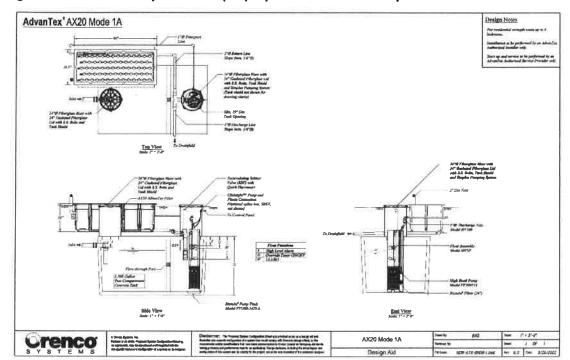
Pretreatment System Example proposed for Bonanza Boy Site
